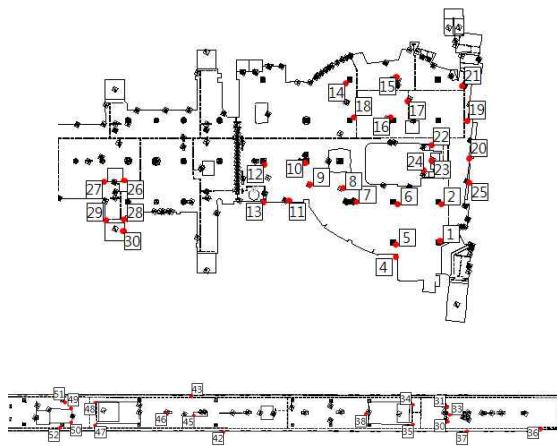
Unground 1floor and ground 1floor of inspection point Location sketch
